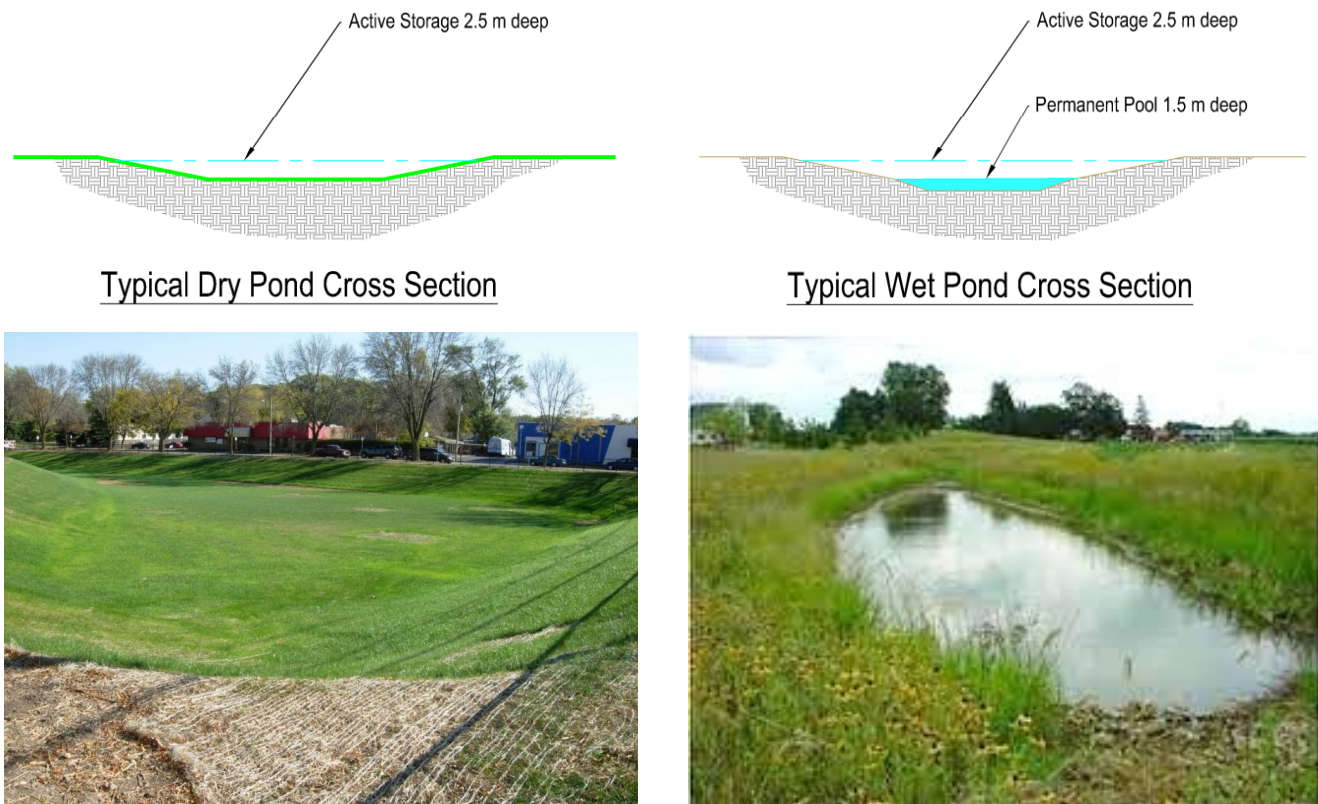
Typical Cross-Section and Images of Dry Pond (L) and Wet Pond (R)
